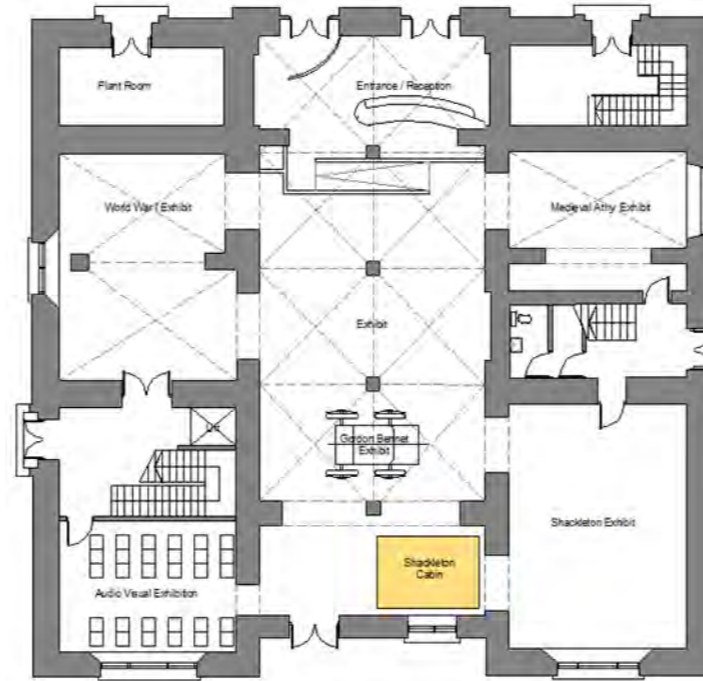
Early layout with the Shackleton Cabin located on the Ground floor
